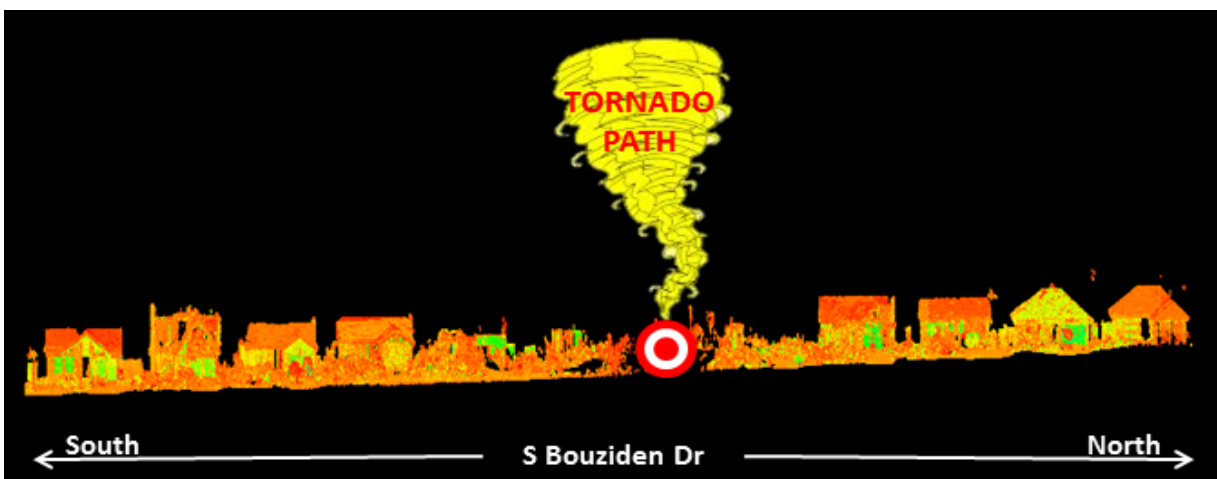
, Point cloud of damaged buildings at west side of the Bouziden Drive and the tornado path.
